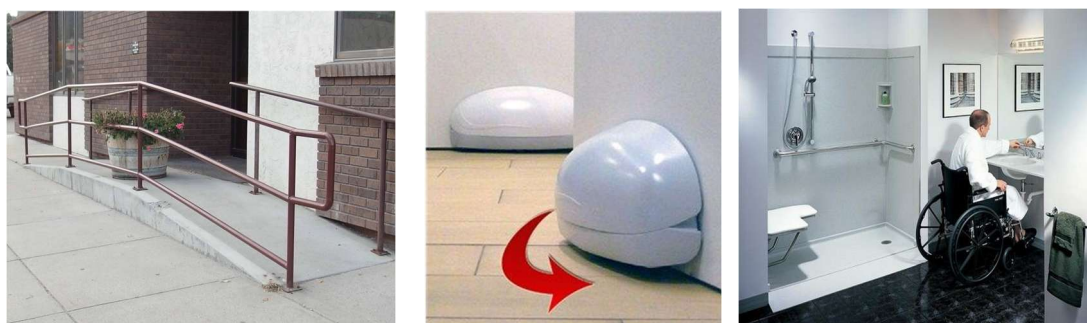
Ramp, Automatic door opening technology and Accessible bathroom
